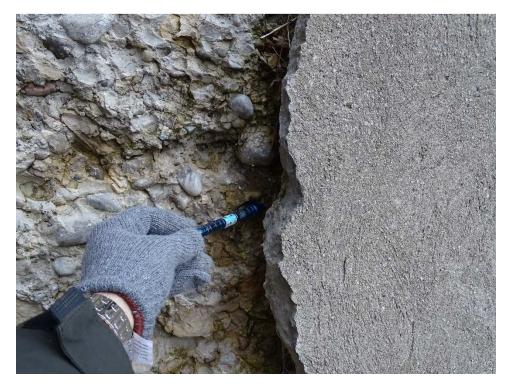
North Downstream Retaining Wall – Severe Spalling
